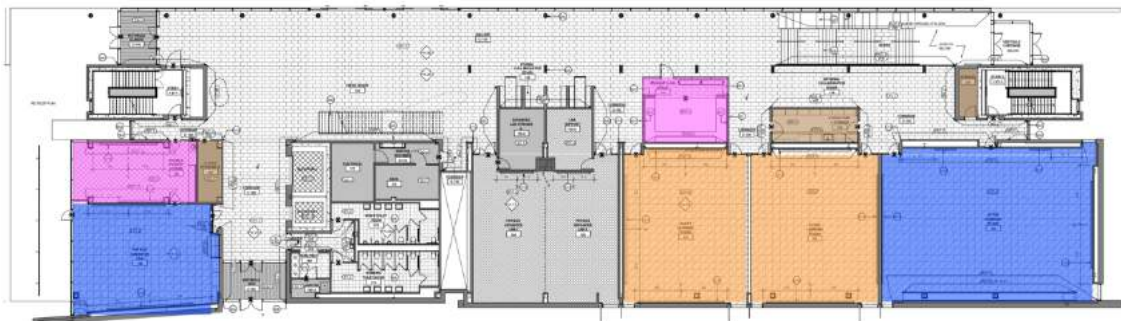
Rooms affected by AHU3 – First floor (Source: Architectural plans)
